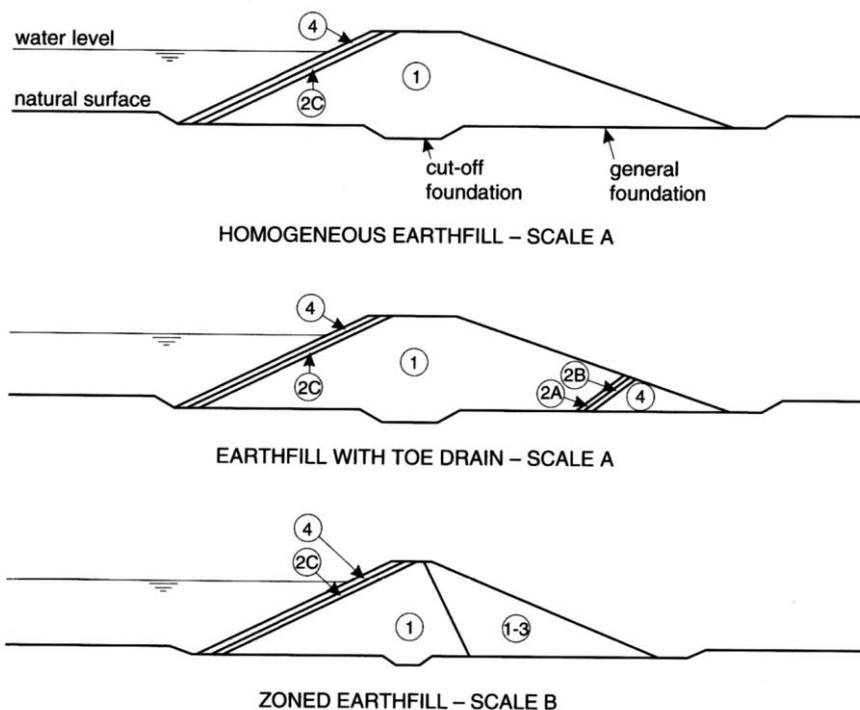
(I): Typical embankment dam structures (Fell et al., 2015)
